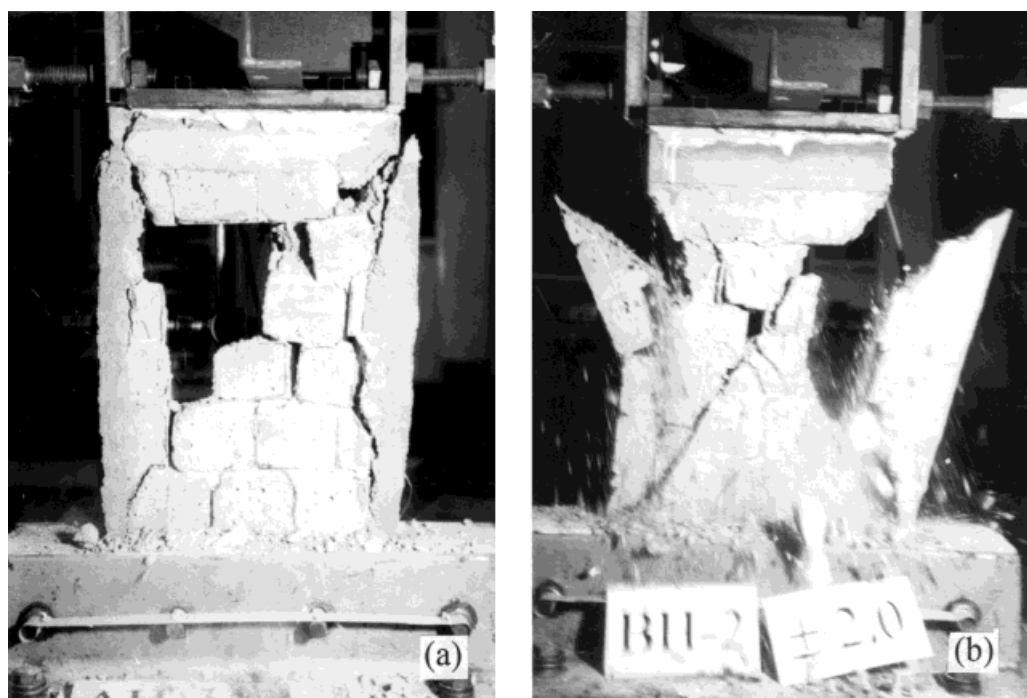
Typical walls after lateral resistance test. Confined (a) and plain masonry wall (b)
